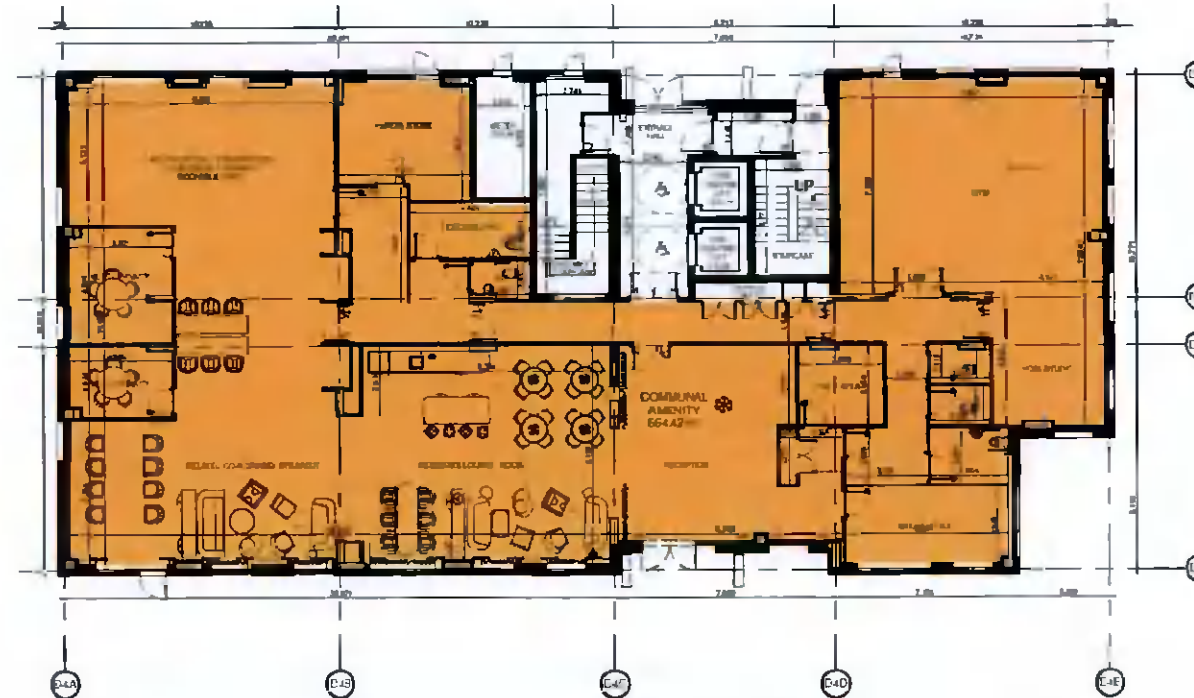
Proposed Ground Floor Plan showing Residential Amenity
